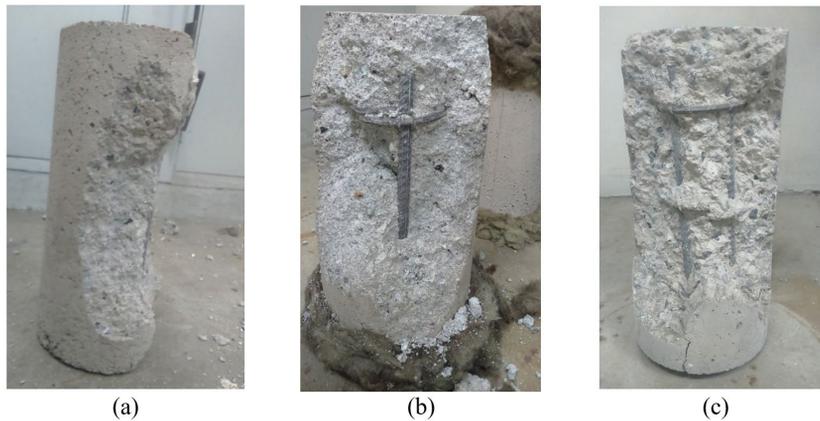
Spalling of specimens: a) CP1_90_2 (408 °C); b) CP2_90_2 (400 °C); c) CP1_120_3 (422 °C).
